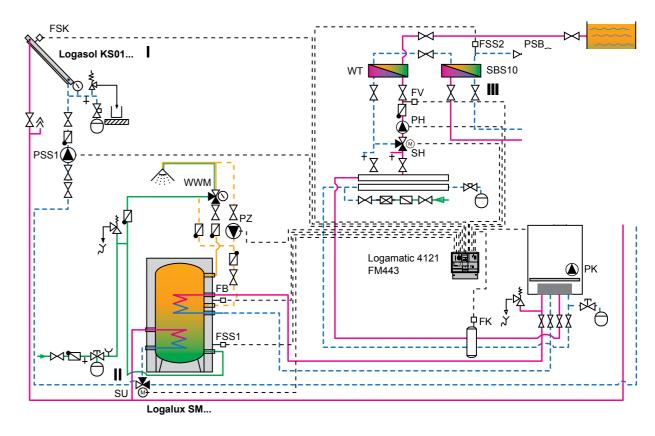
Solar DHW heating and swimming pool heating with a gas or diesel boiler and a DHW cylinder (here: Buderus system)².
